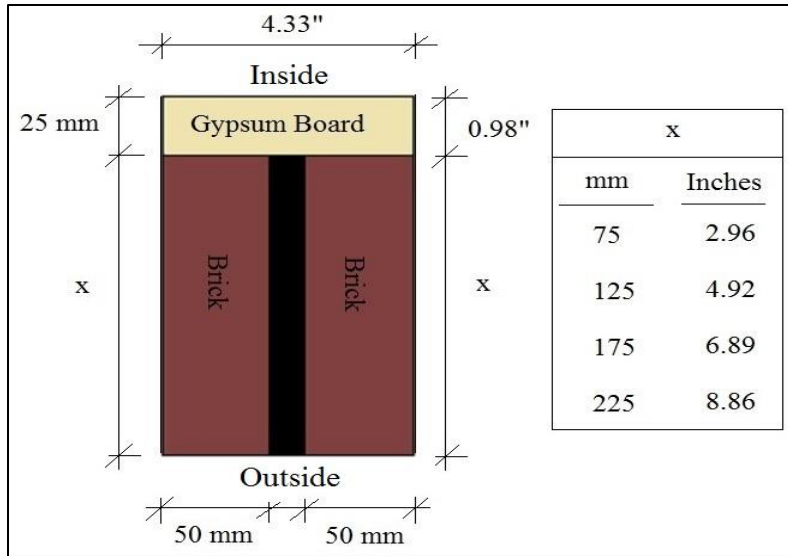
Cross-section of the walls equipped with PCM-impregnated gypsum board
